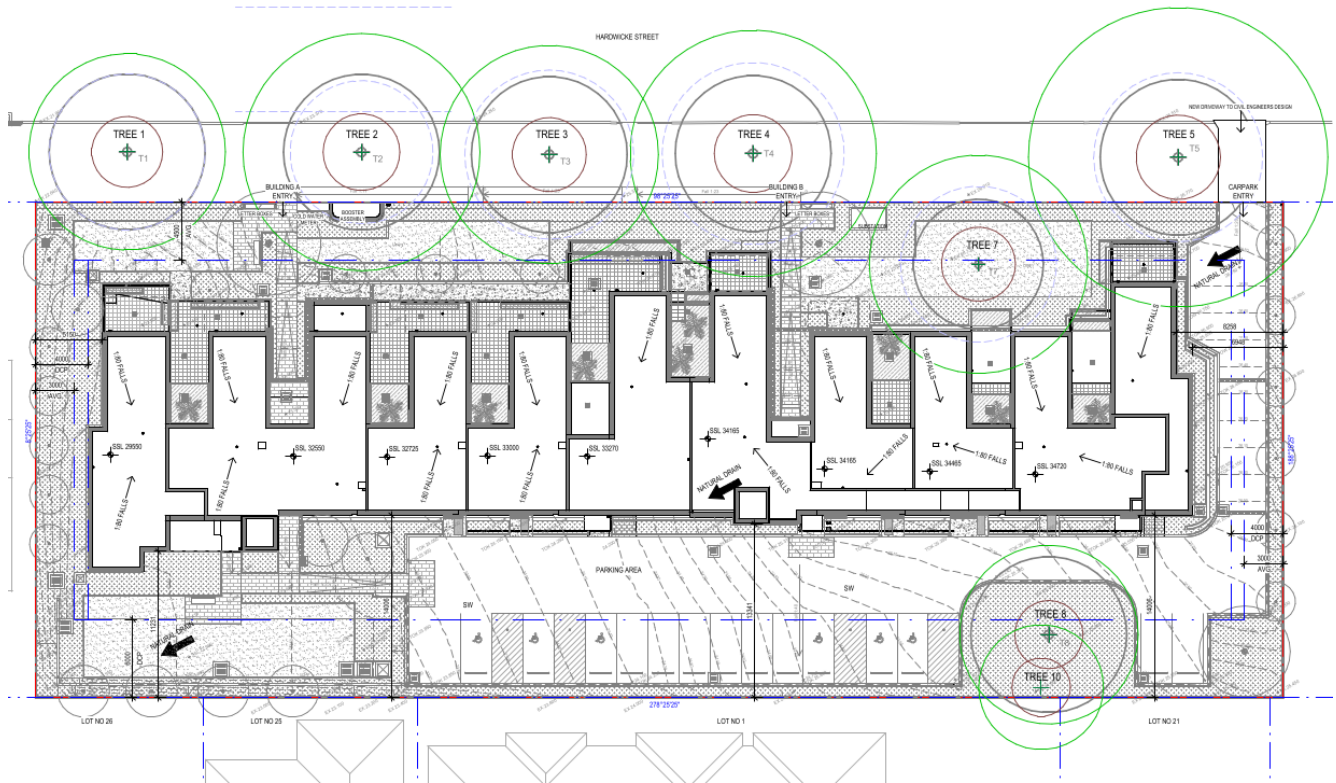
Extract from Architectural Plans – Site Plan (Source: Architectural Plans, Custance Architects, dated 06/09/2024)
